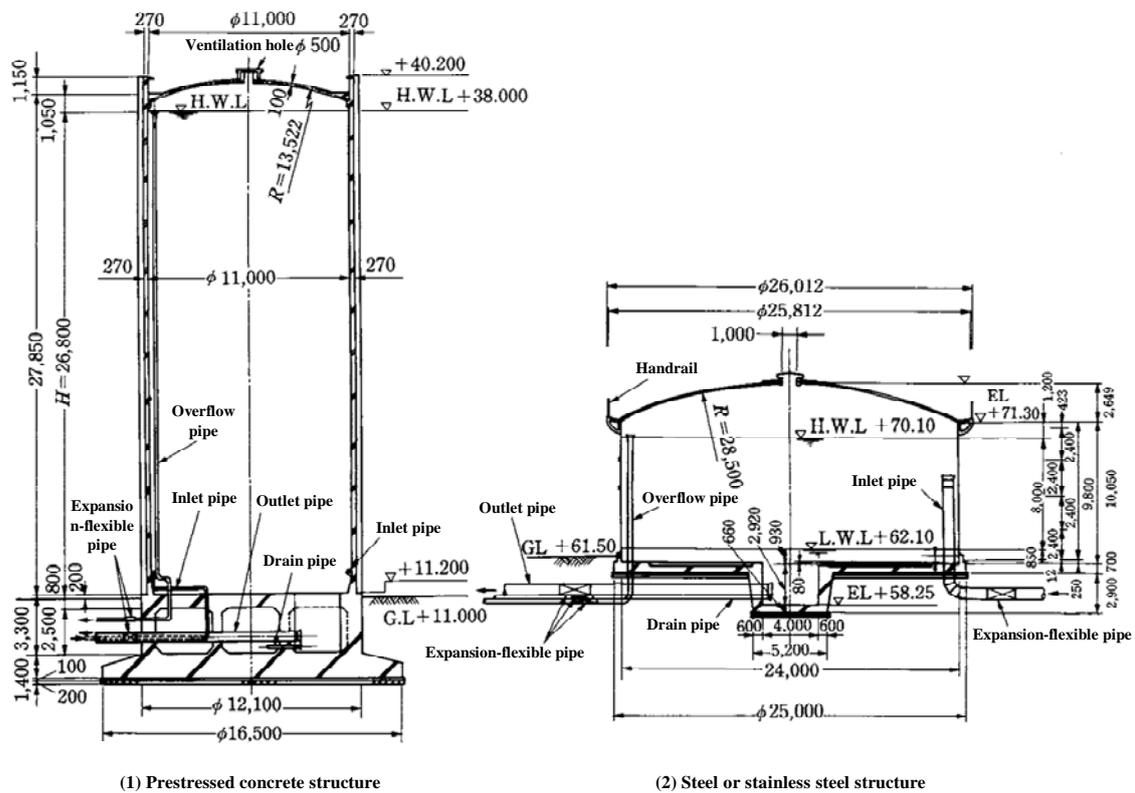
Examples of structure of the standpipe (Unit: mm)
